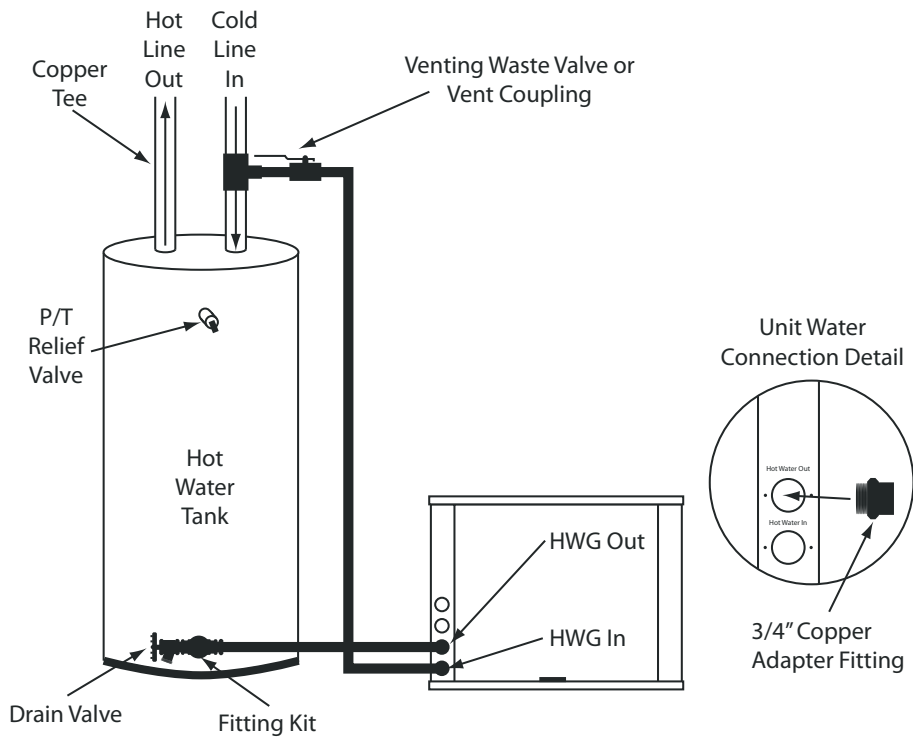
Water Heater Connection Kit Assembly for Bottom of Water Heater
